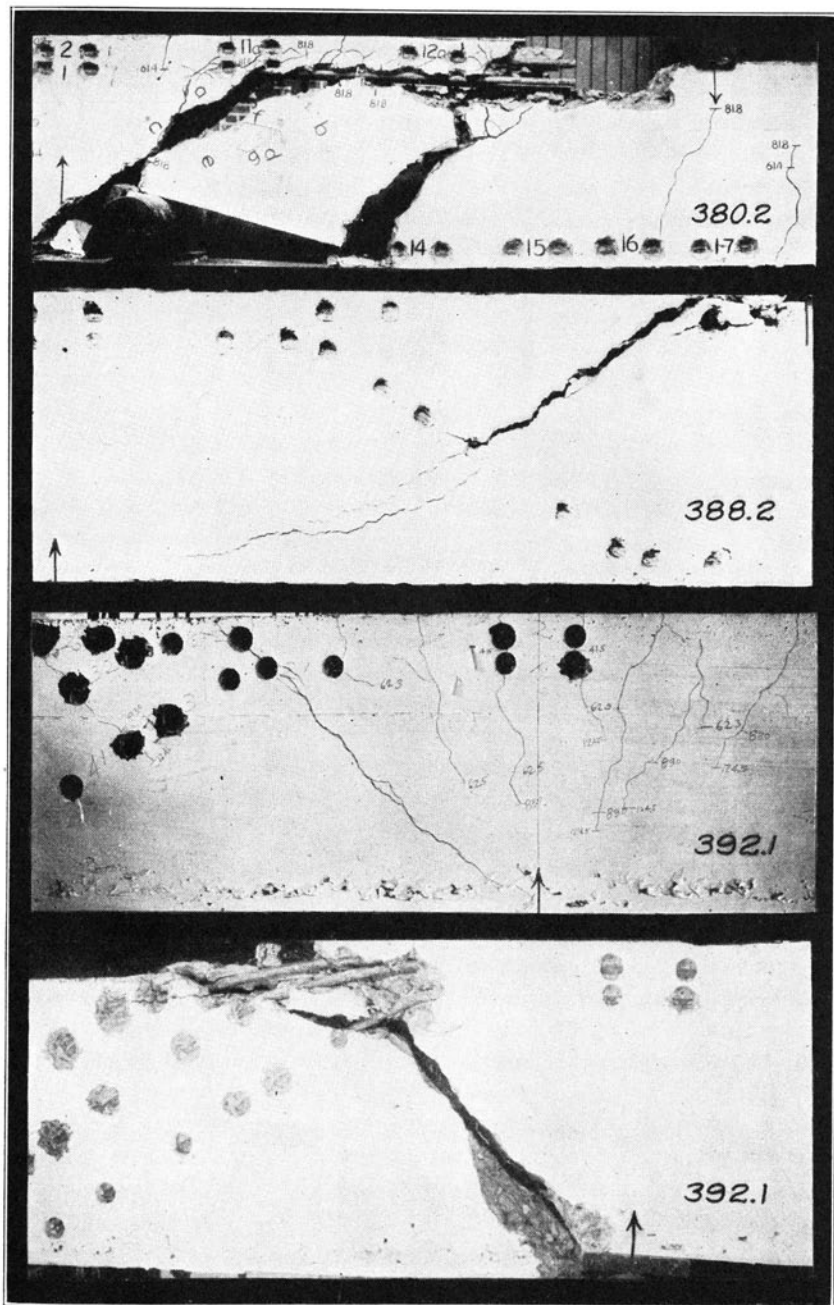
VIEW OF PORTION OF BEAMS 380.2, 388.2, AND 392.1 AFTER TEST
